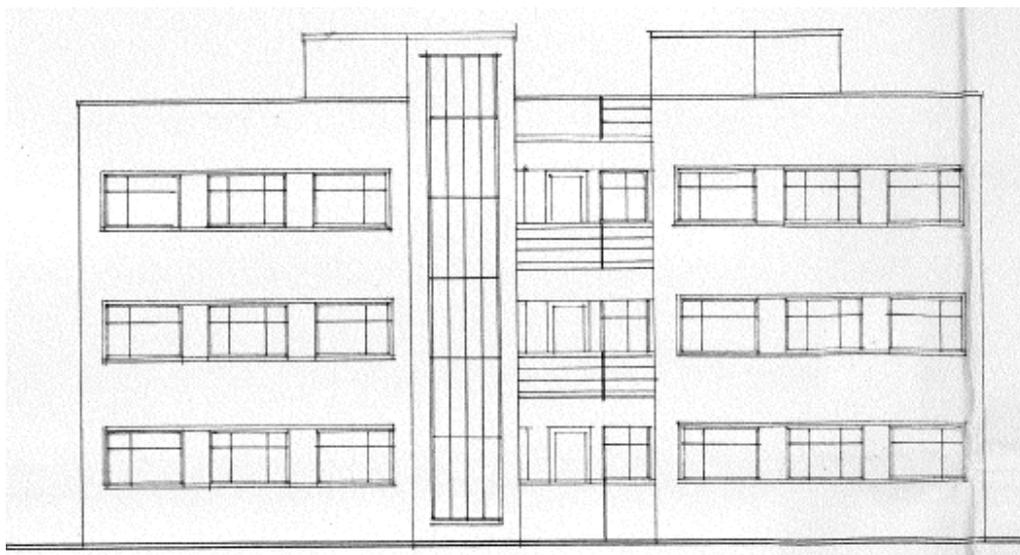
Front elevation, from plans related to Building Permit U1174 (M Benshemesh, 1951) (Source: Council Building File)
